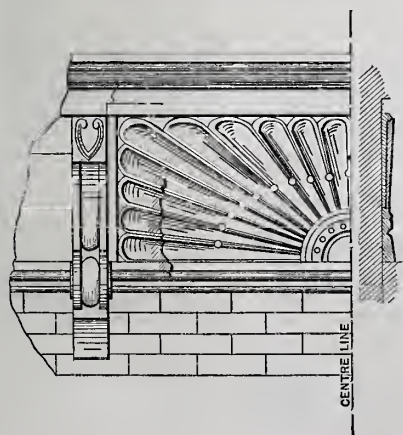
Ornament Under Dormer Window, Front Elevation.—Scale, 1/2 Inch to the Foot.
